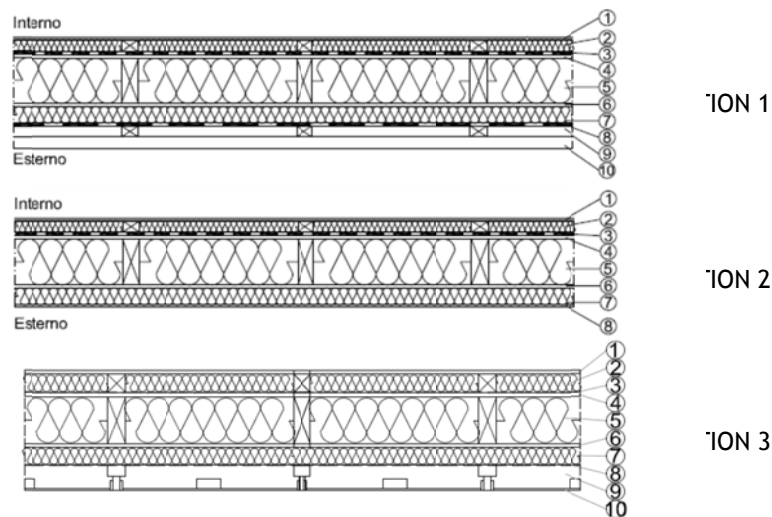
Horizontal section of three wooden prefabricate wall types
